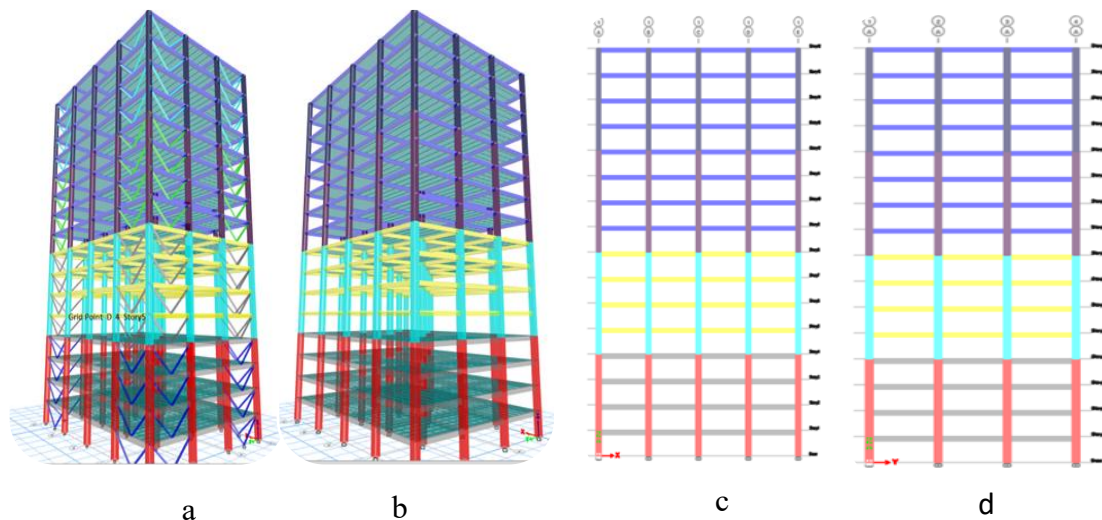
Modeling of 16-story building a) 16-story (16X) 3D with V-shape steel bracing frame, b) 16-story 3D without steel bracing, c) along X direction without bracing, d) along Y direction without bracing
